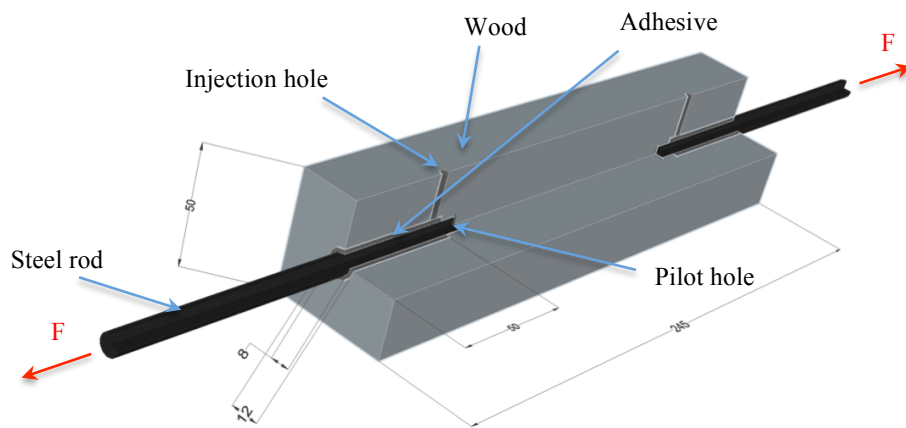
Glued-in rod specimen in the pull-pull configuration (dimensions in mm)
